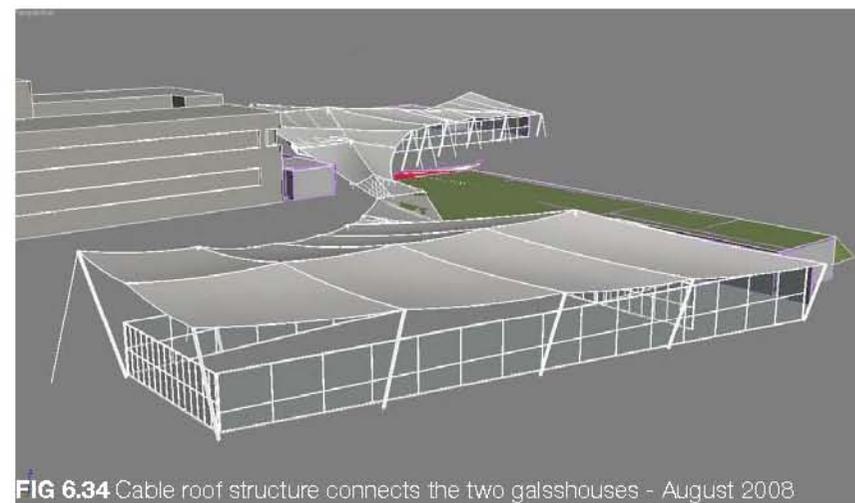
Cable roof structure connects the two glasshouses - August 2008
